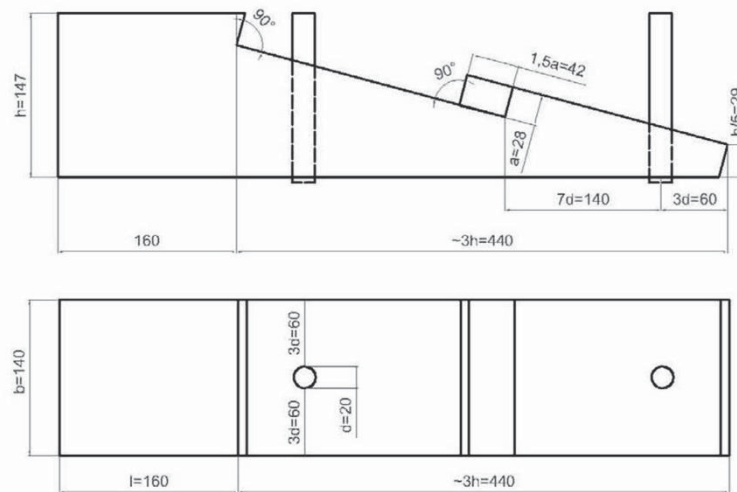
Specimen geometry of samples A_D20 e B_D20 (dimensions in mm)
